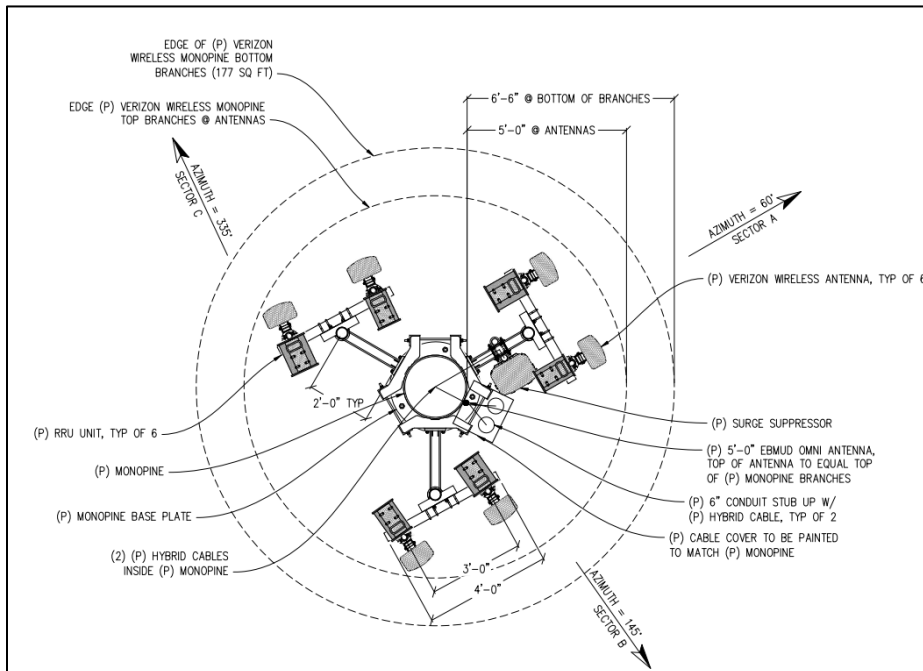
Antenna Plan (Source: Plans, Page A-4).
